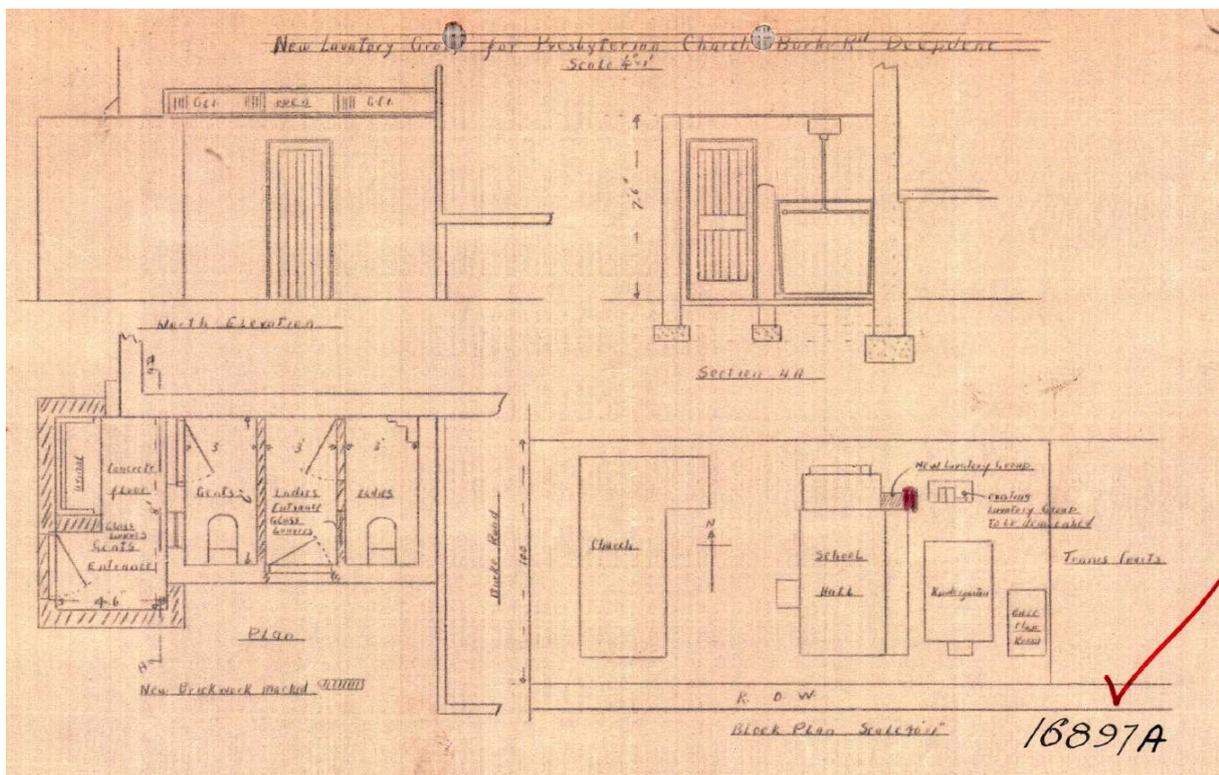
'New Lavatory Group for Presbyterian Church Burke Road Deepdene' plans for Building Permit No. 16897A, 14 May 1945.
